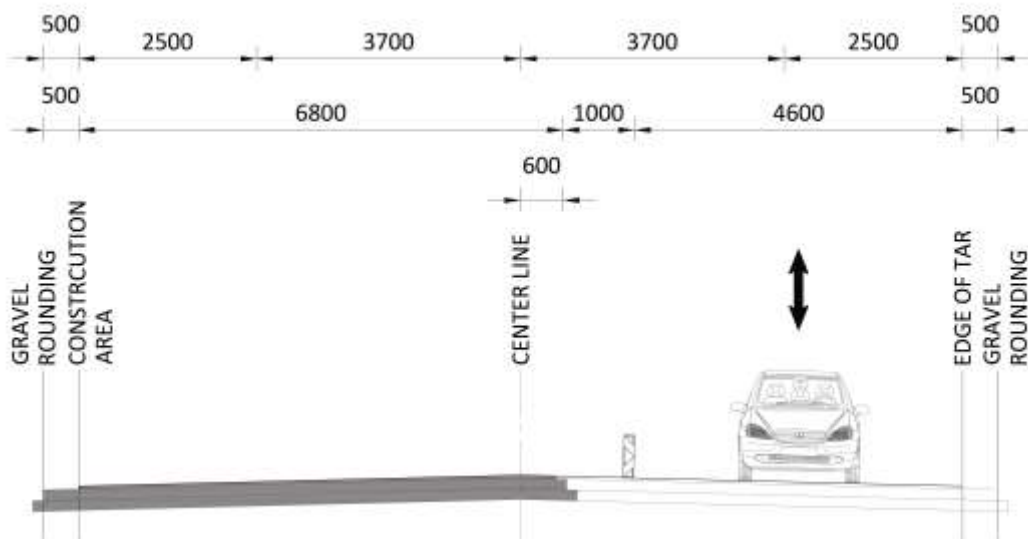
Typical arrangement for half width construction (one-way traffic using Stop/Go)
